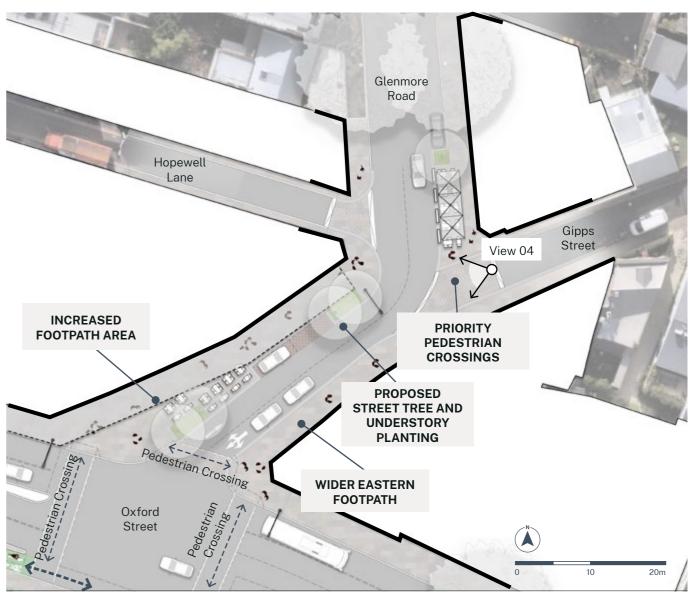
// Indicative only, Public Domain and Activation Plan of Glenmore Road, subject to further stakeholder and community input, and design development.
